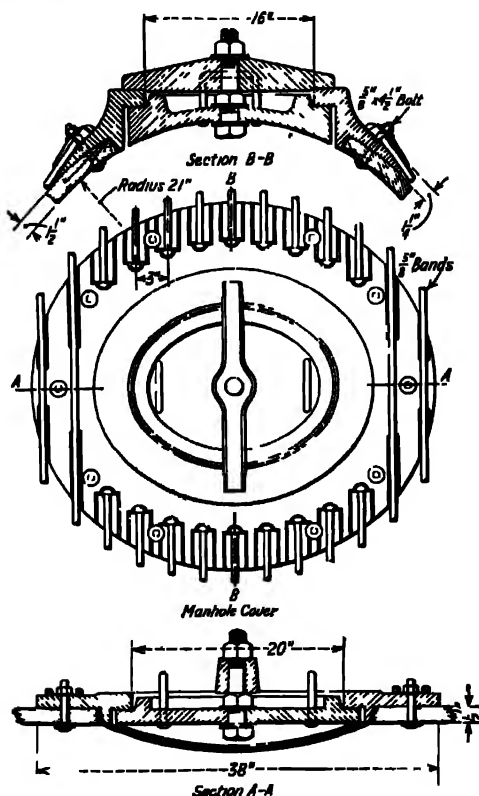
Cast-iron manhole for 42-in. wood-stave pipe. (F. C. Kelsey, Consulting Engineer, N. Y. C.)
